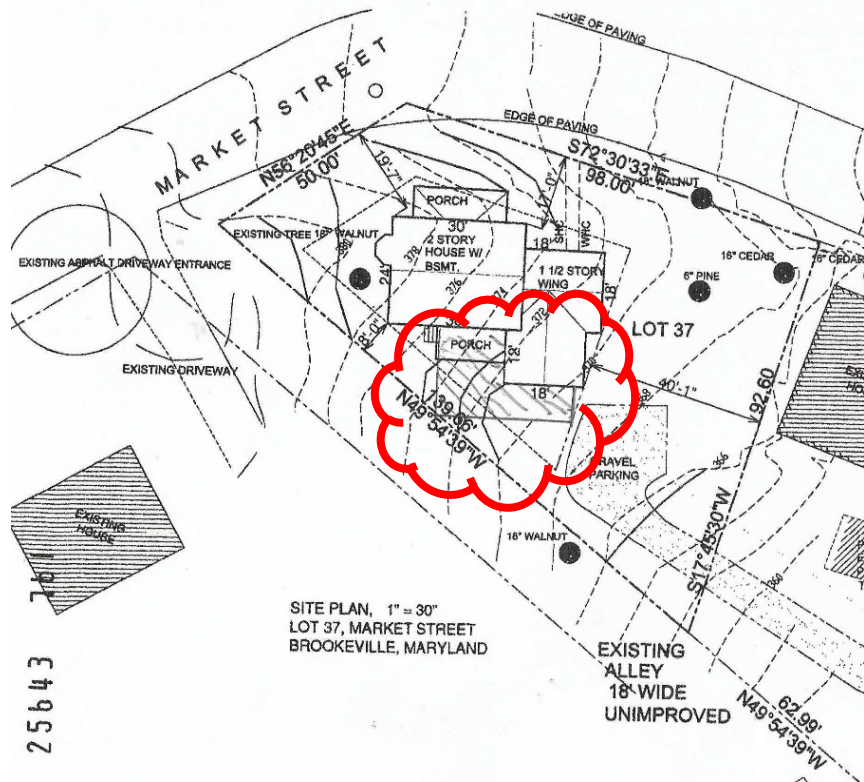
The proposed expanded deck is clouded in this site plan provided by the applicant.
